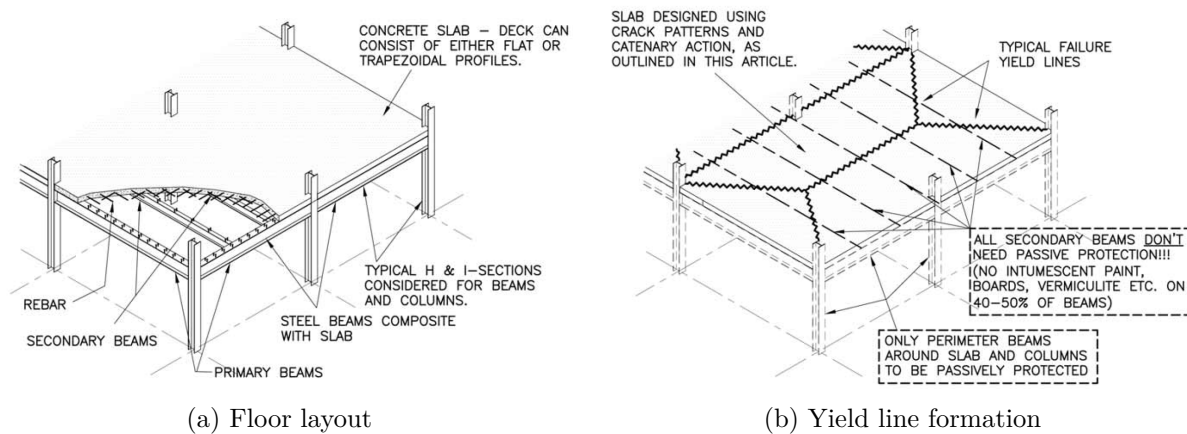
Composite floor layout and yield line formation (Geldenhuys and Walls, 2015)
